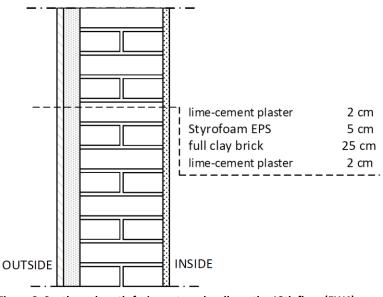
South- and north-facing external walls from ground-floor to 12th floor (EW3).
